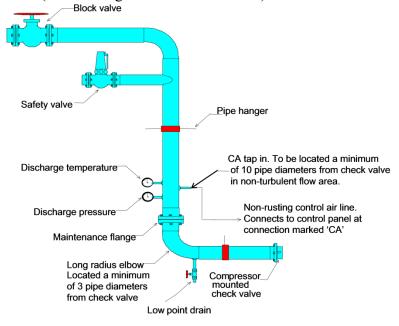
Be sure to install a properly sized safety valve before the block valve for centrifugal compressor discharge piping.
